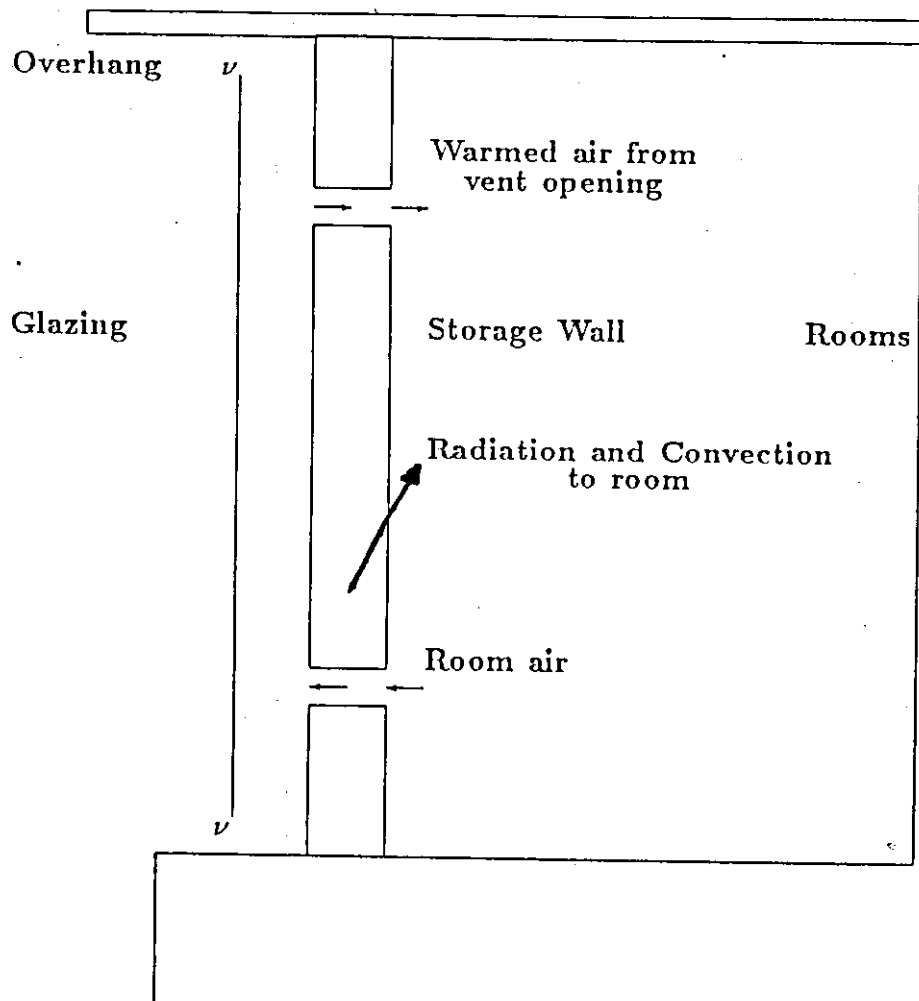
a. vent dampers in Trombe wall are used to vent the gap between glazing and wall in summer.
